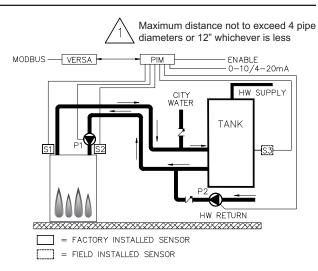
WH Units - Single Water Heater with Tank H Units - Single Boiler with Process Tank
